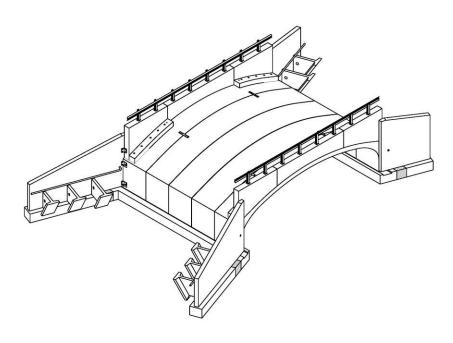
Con/Span® Bridge System (source: Contech Construction Products, Inc.)
